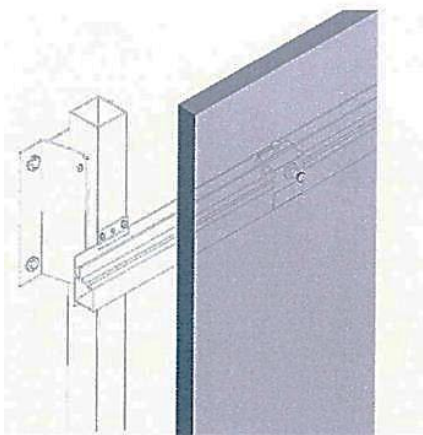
Substructure with hanger solution of PV module point fixing (Planning and installing, 2008).
